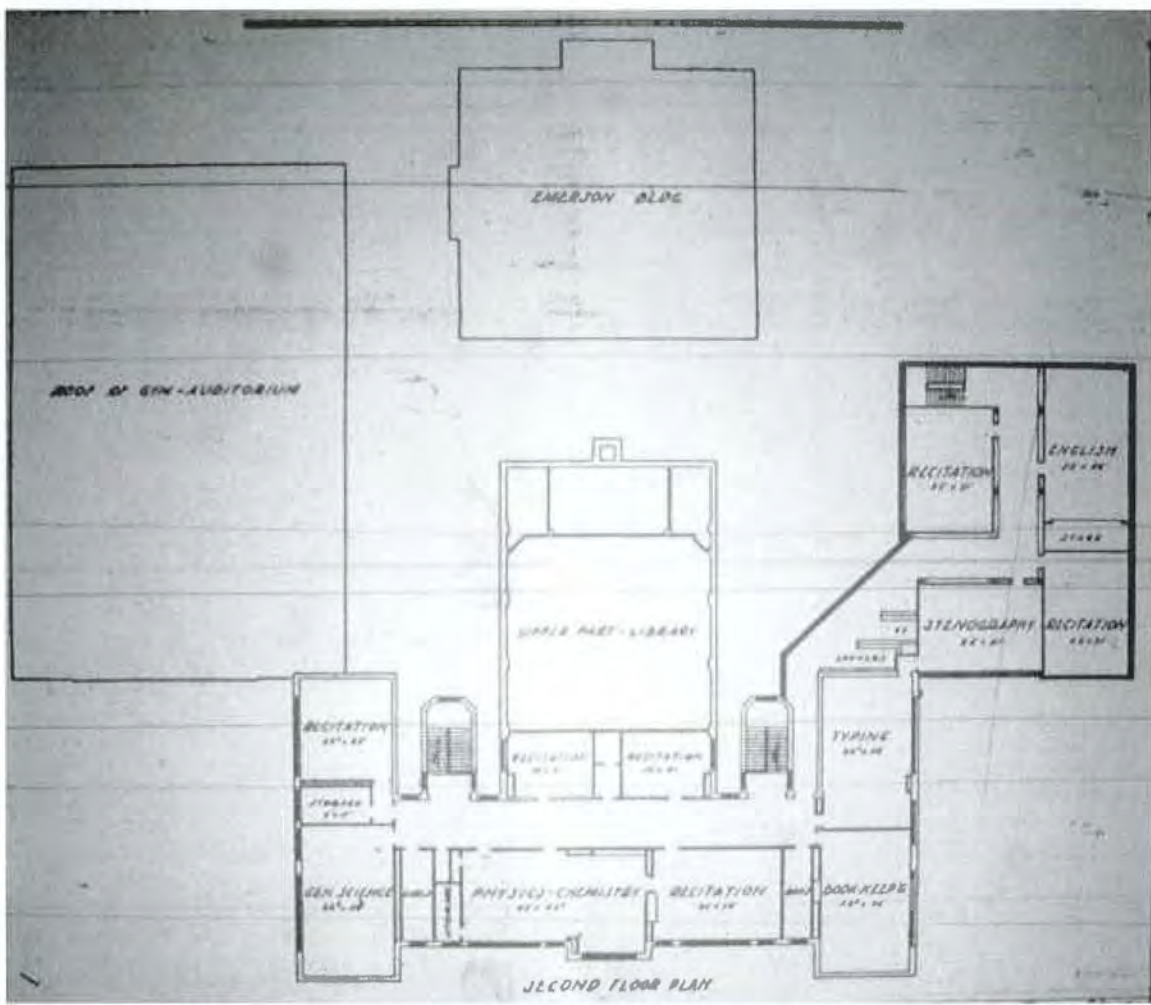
New Ulm High School, Third Floor, 1939 (Second floor in 1939 plans)
